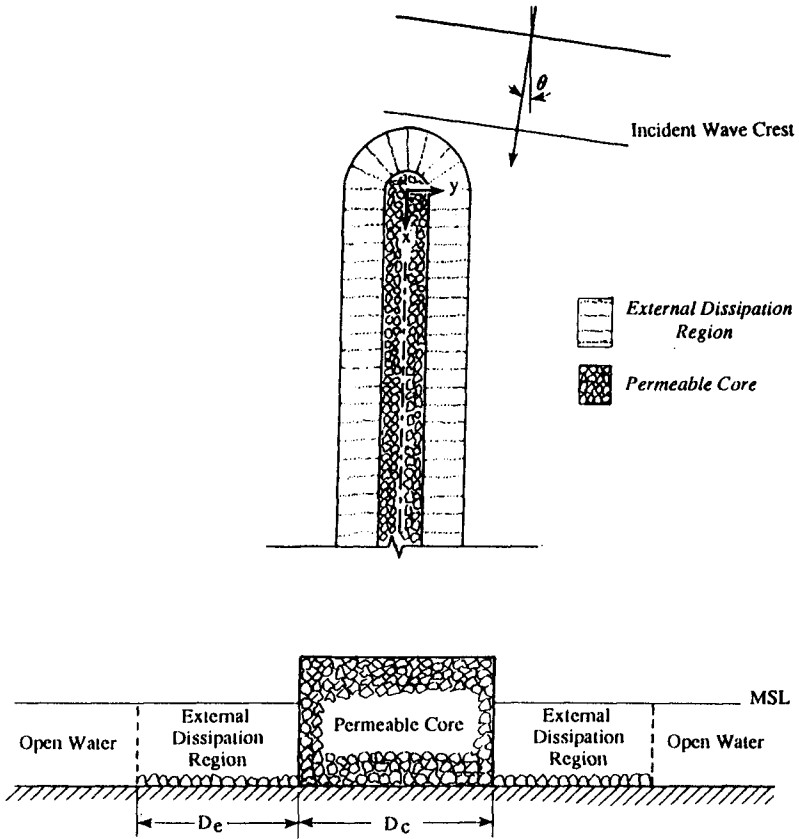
Plan view (upper) and cross-section (lower) of model breakwater.
